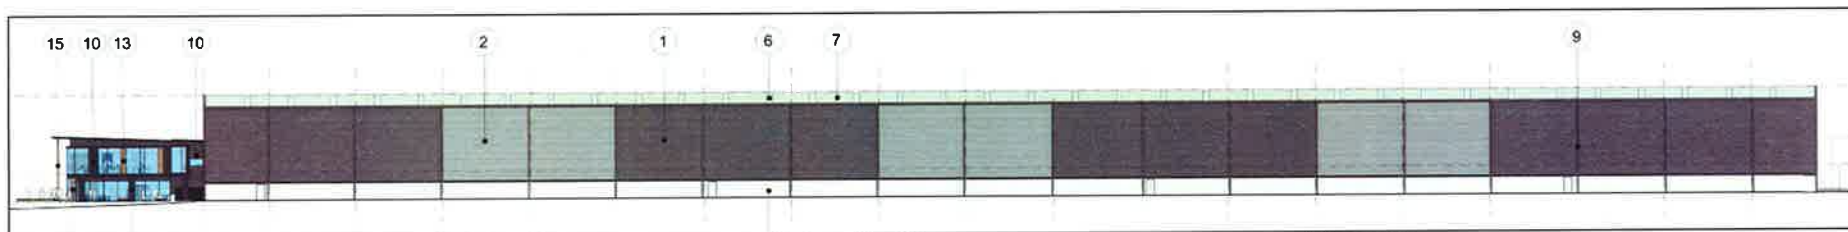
Façade Treatment Example External to Site – Building 1 Northern Elevation to Pinegrove Cemetery
